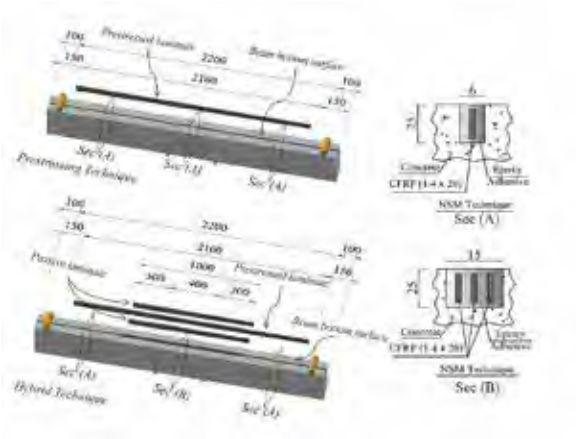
CFRP reinforcement details of hybrid and prestressing NSM techniques (dimensions in mm)
